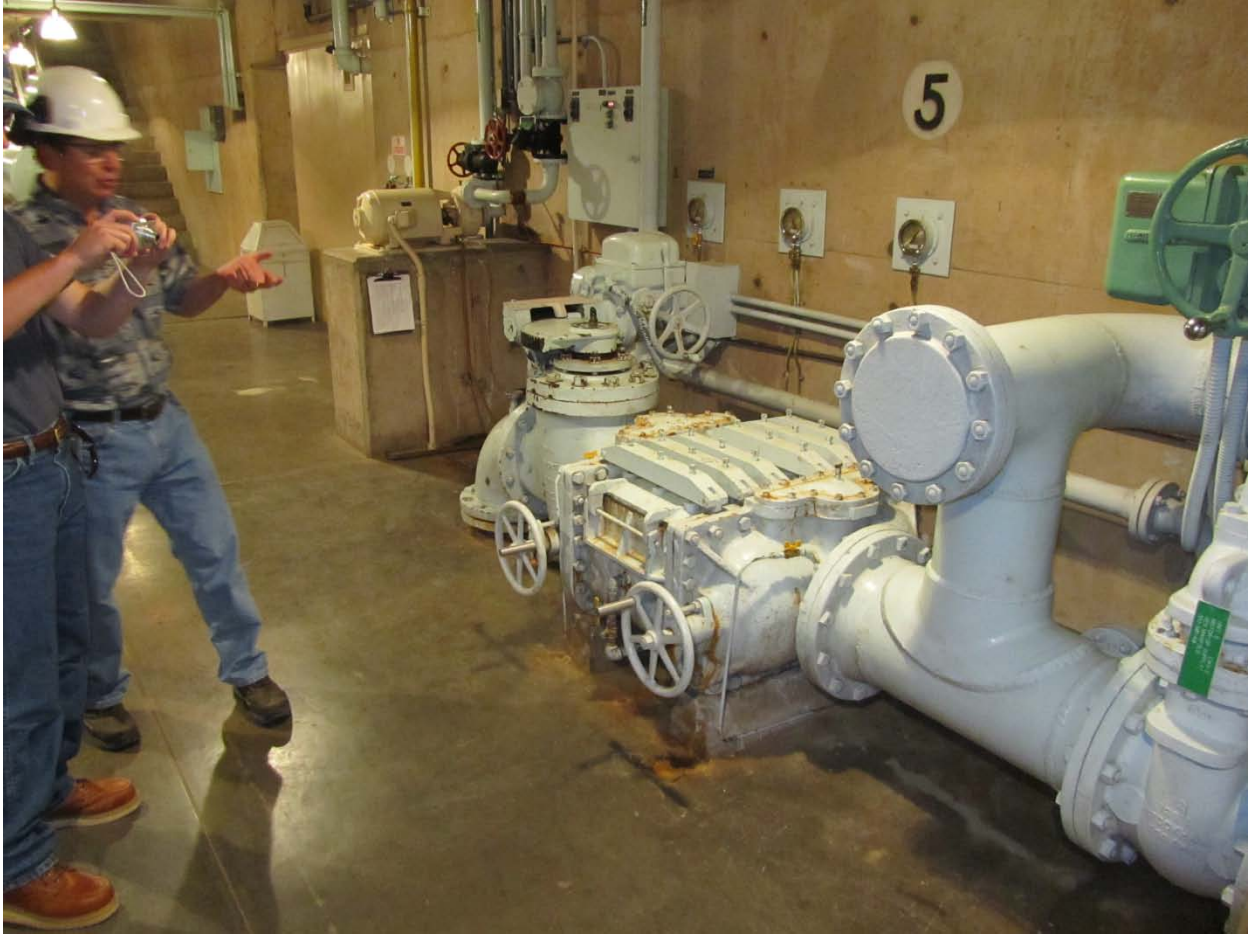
Cooling water line where it attaches to the inlet penstock (under concrete)
